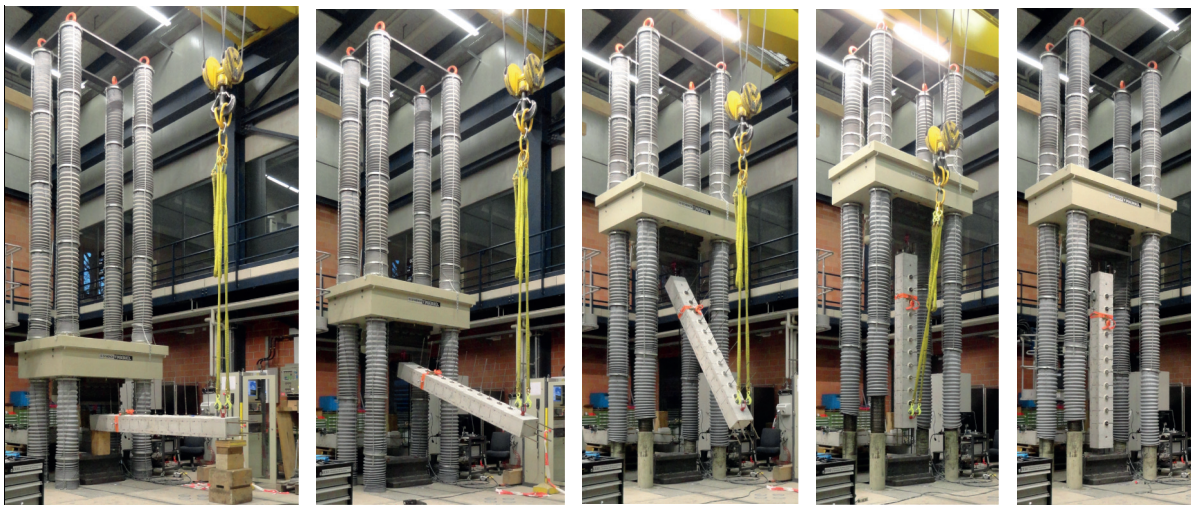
Installation steps of the concrete specimen in the test setup prior the crack development and pull-out of the details in the transverse direction
